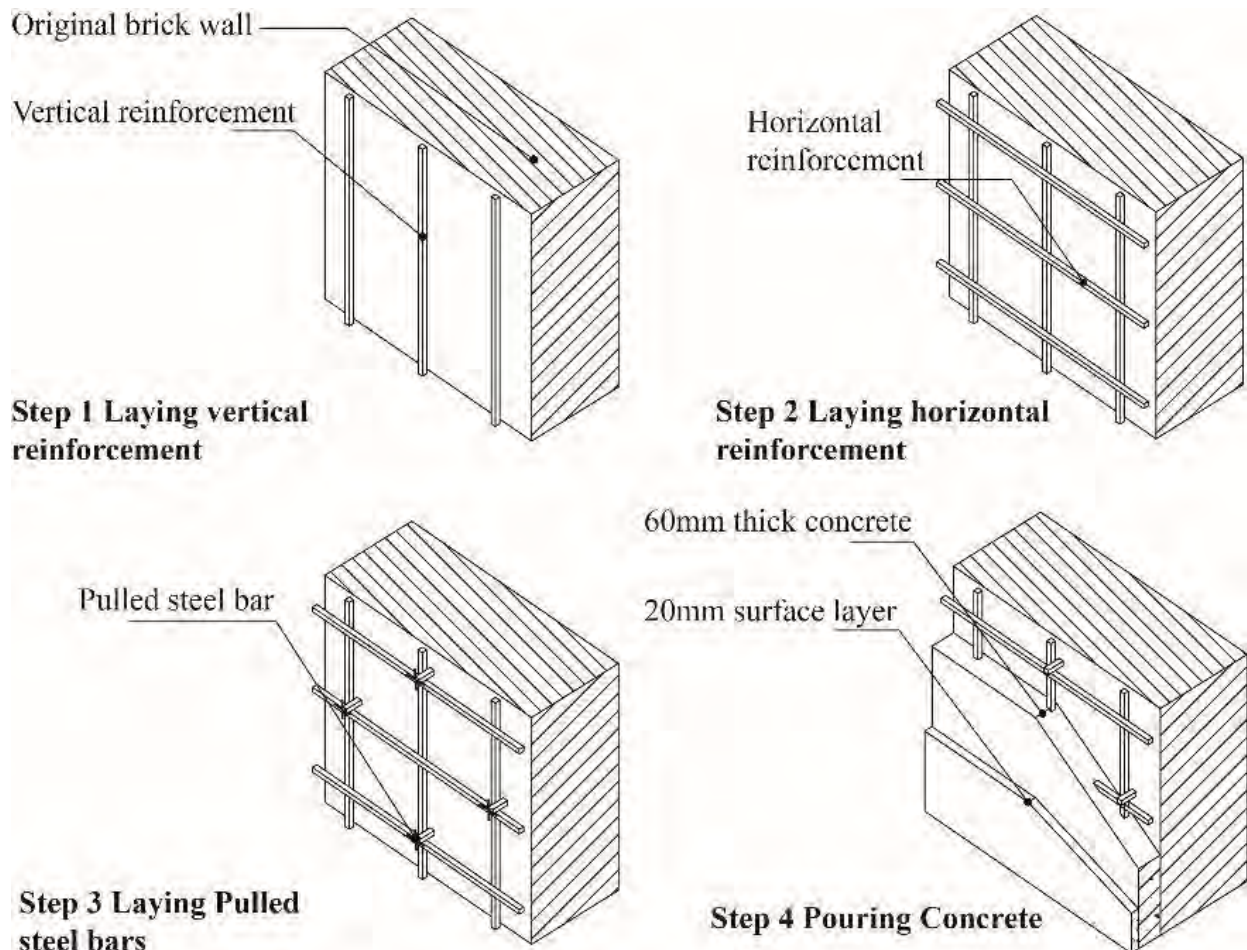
Wall reinforcement step (Image source: Professor Zhou Qi's studio at the School of Architecture, Southeast University)
